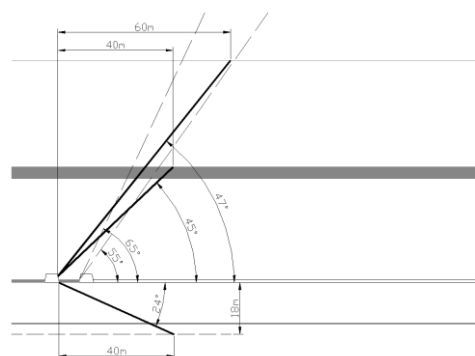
Underground cross measure roof and floor boreholes drilled from gate road
